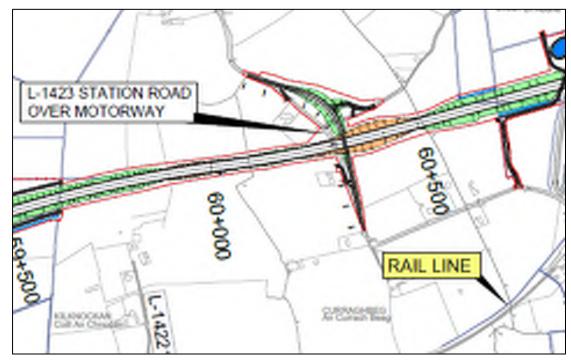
Proposed Realignment and Bridge on Local Road L-1423 at Adare (as per the November 2018 Design Update)
